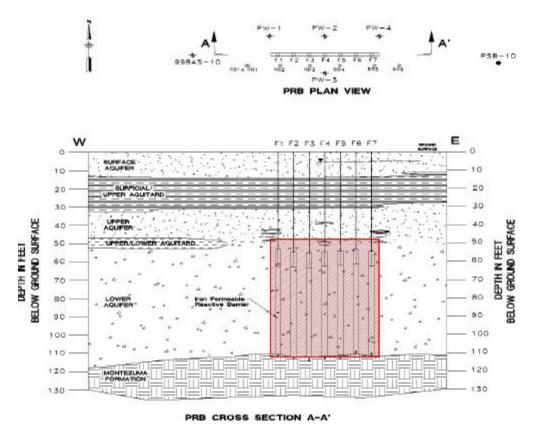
Plan and Sectional View of Pulse Test Wells at the PRB Site.
